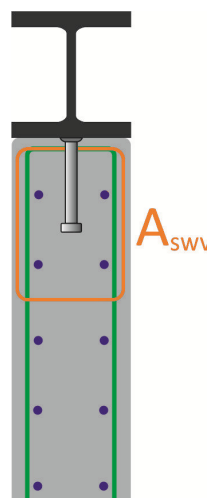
DETAILS ON THE STUD CONNECTORS IN THE HORIZONTAL DIRECTION AND ITS REINFORCEMENT
